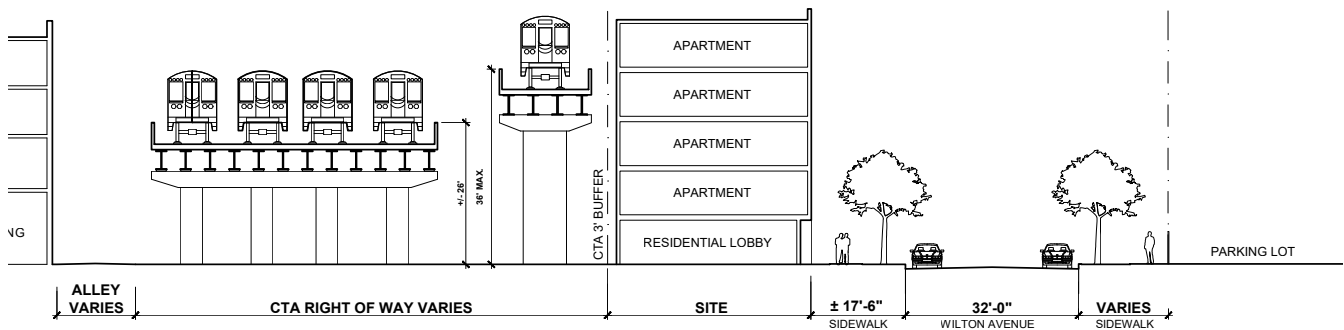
RPB 05 Apartment Building at School Street Site Section
